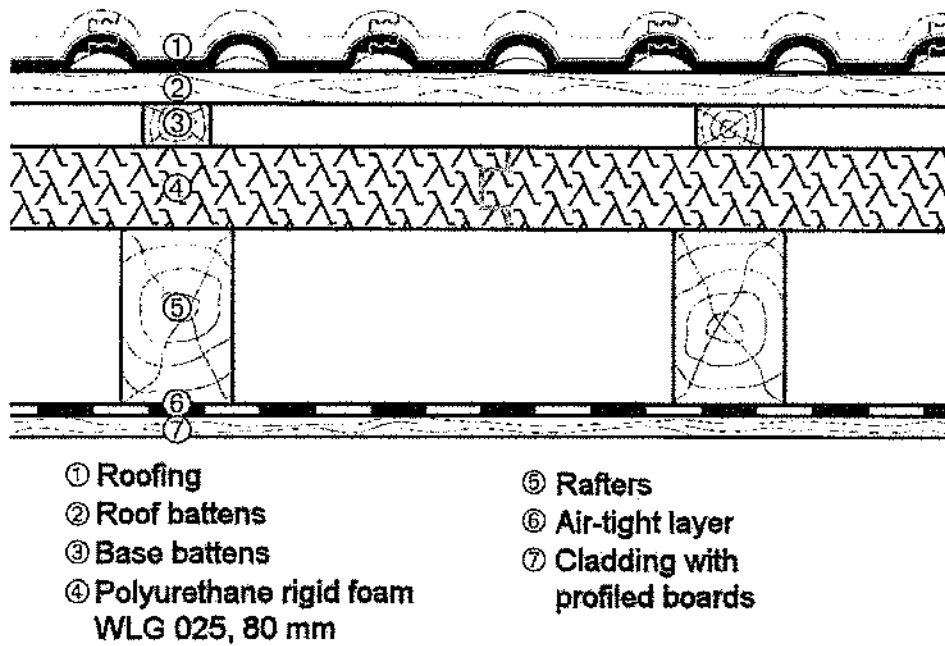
Polyurethane pitched roof insulation with an air-tight layer below the rafters
